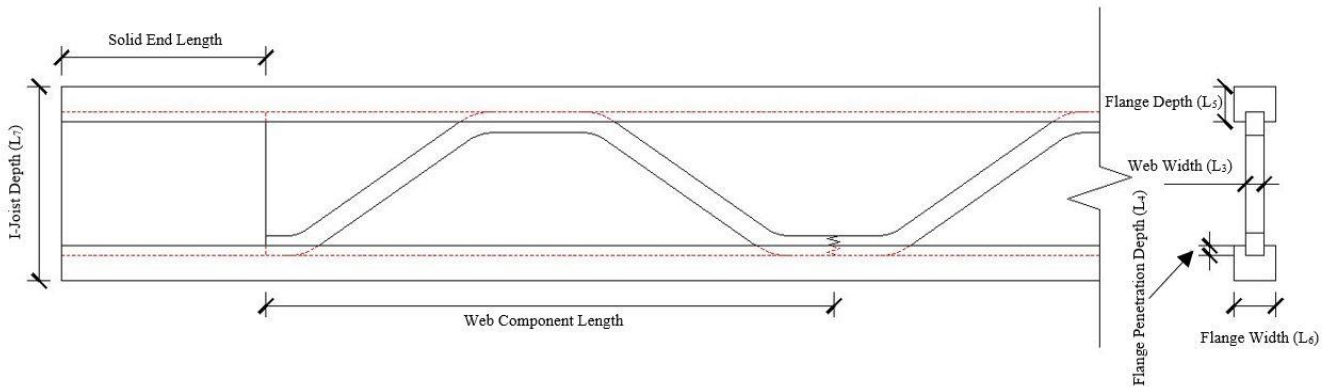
Longitudinal section and cross-section of latticed webbed I-joist with geometric parameters.
